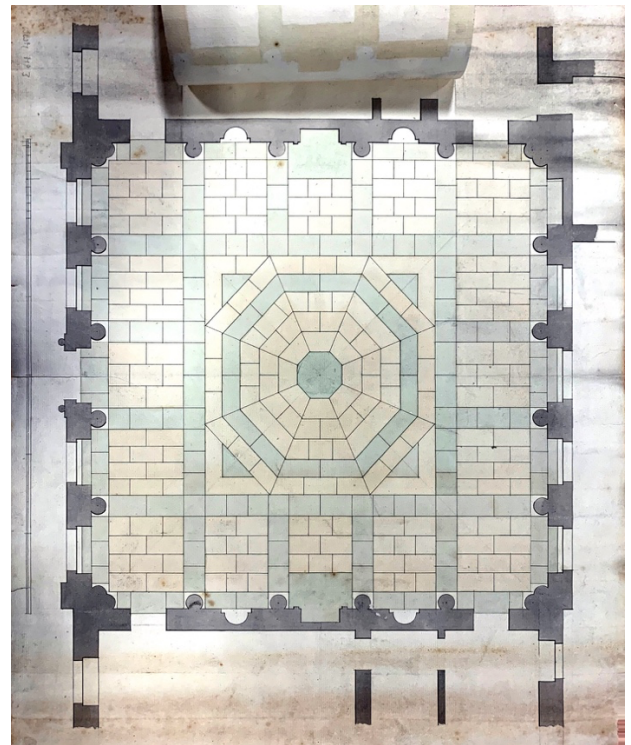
Plan for floor of the Hall, alternative design, n.d. WWM MP 3.
